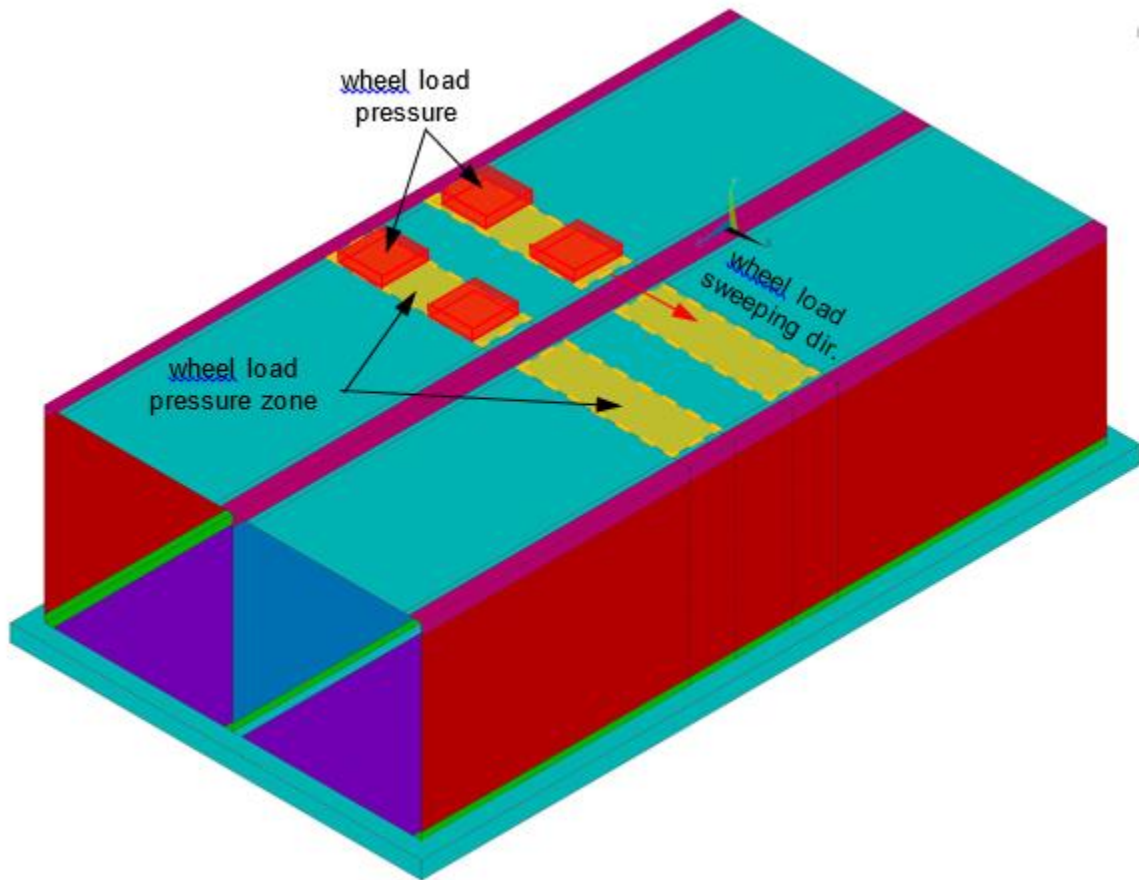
Wheel load pressure on top slab (case of wide culvert and tandem axle)
